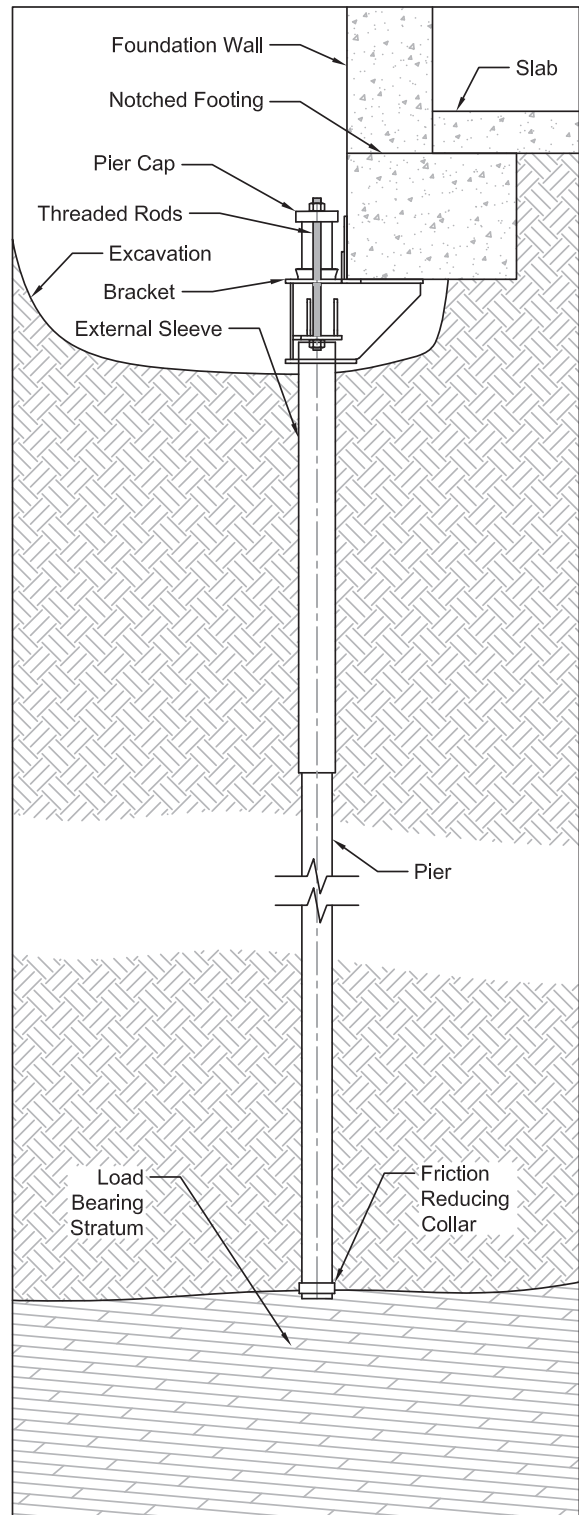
Foundation Supportworks PP288 push pier system with an under-footing bracket
